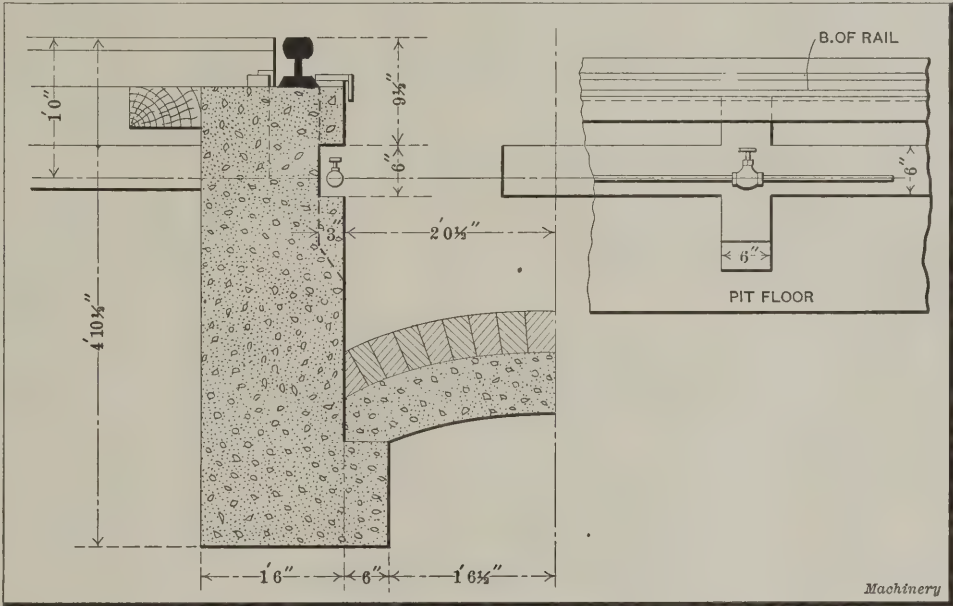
Method of setting Water and Steam Pipes in Pit Walls
